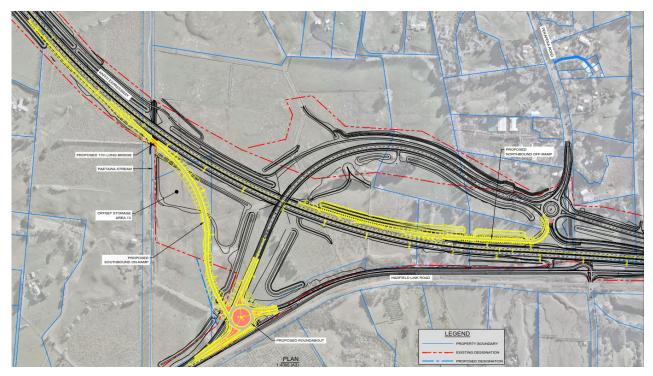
Plan illustrating the layout of Option 1, proposing two new ramps (in yellow) in addition to the existing roading network (in black)
